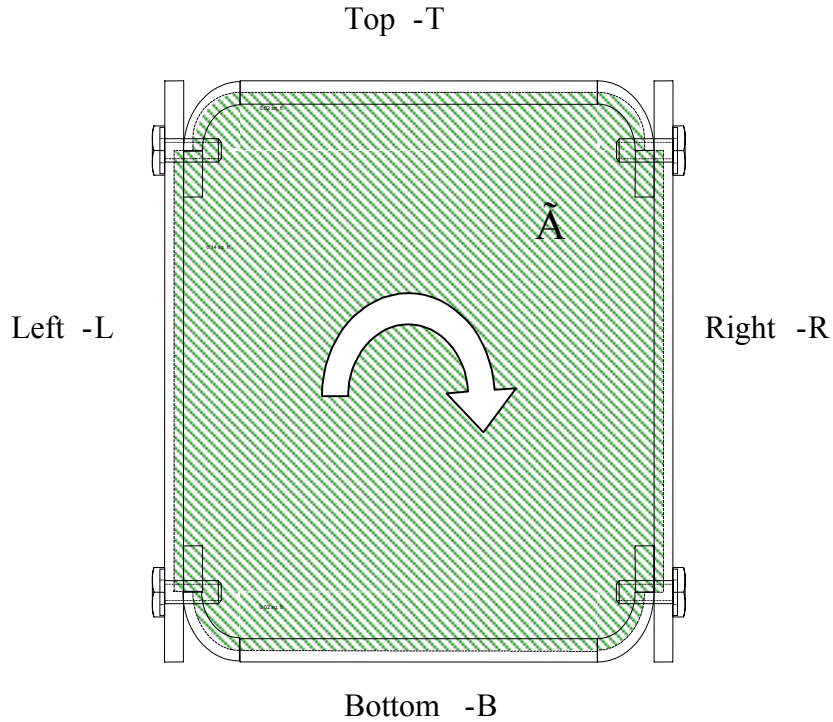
AREA ENCLOSED BY THE CENTERLINE OF THE CLOSED WALL BOX BEAM CROSS SECTION
